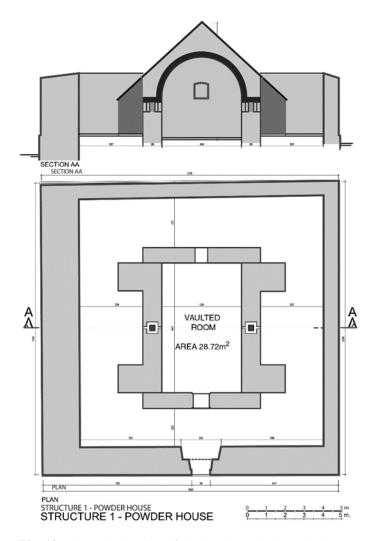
Plan and elevation of the barrel-vaulted powder house.
